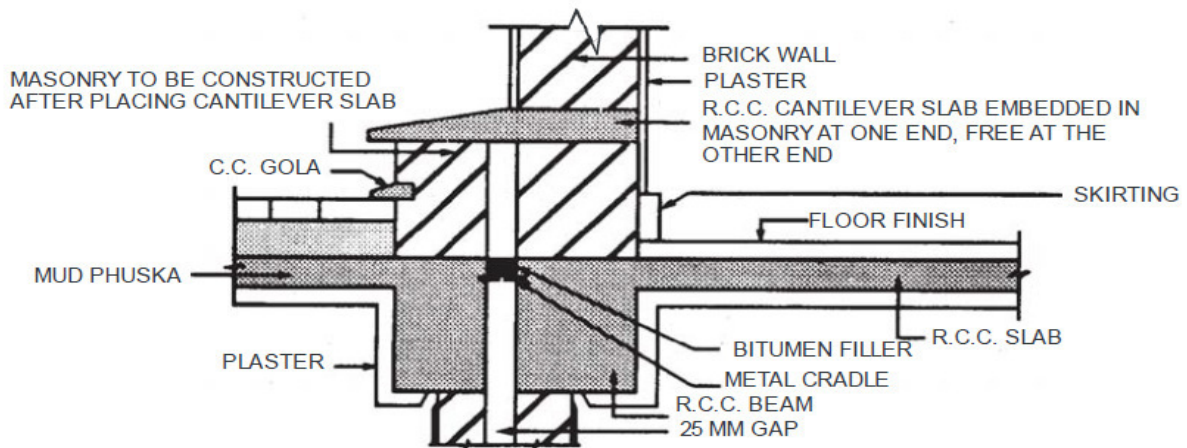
Typical Details of Expansion Joint at Roof & Floor Junction
